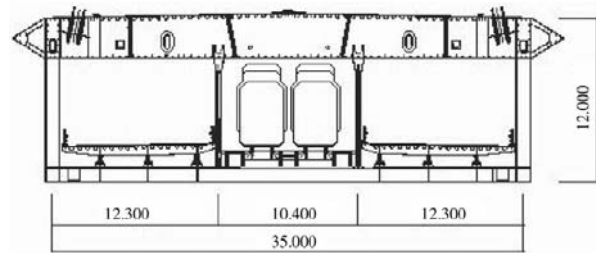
cross section of Yeongjong Grand Bridge stiffening girder
